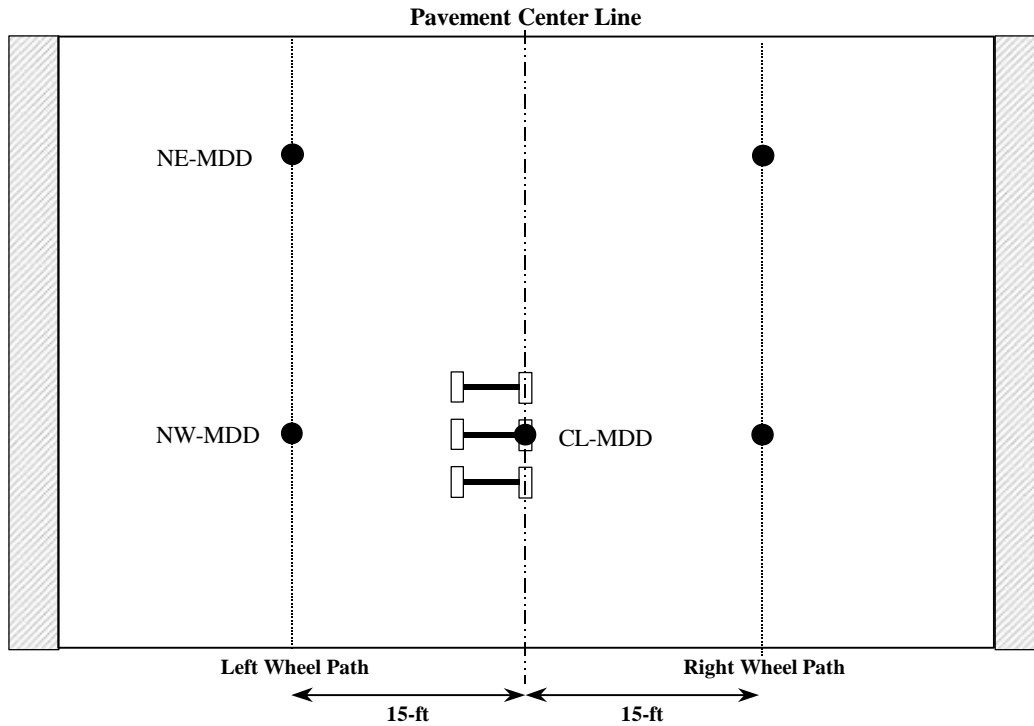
MDD Locations in a Test Pavement and Gear Configuration for Static Tests.
